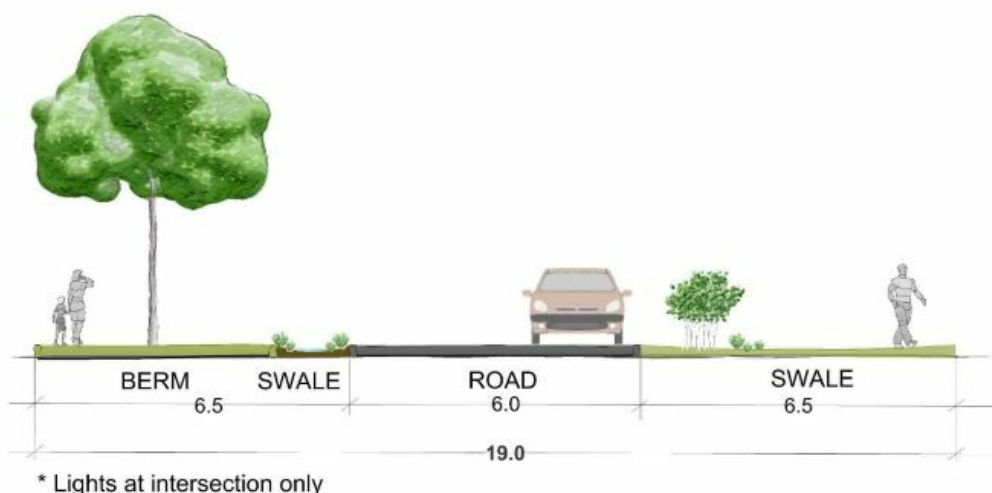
Right of way / local road standards for the Hamptons Road ODP Area.
